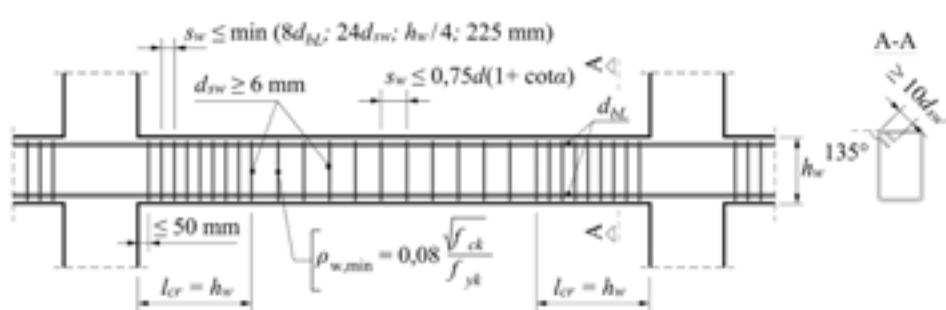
Transversal reinforcement detailing requirements for beams in seismic MRF – DCM
